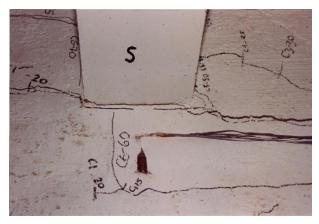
Transverse cracking in floor slab at ultimate moment from South
